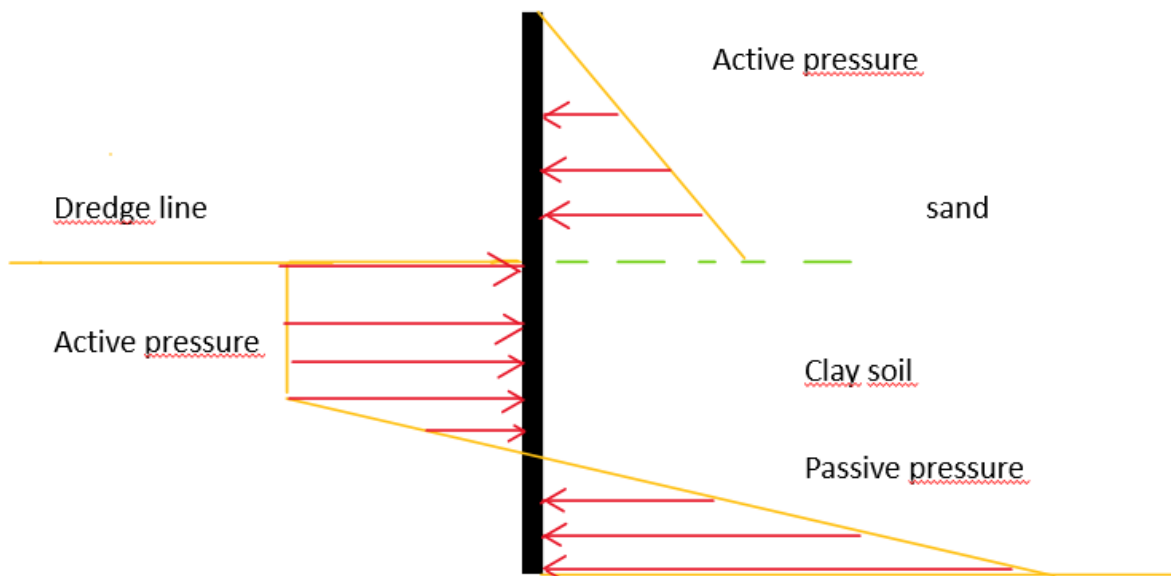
a cantilever sheet pile wall earth pressure distribution penetrating clay soil without ground water level. Illustrated by Yonas Tsighe
